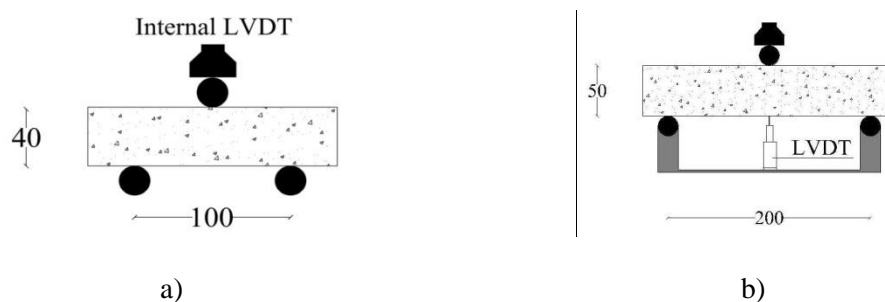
Test setup for three point bending test using un-notched specimens: a) M1 and b) M2 (dimensions in mm)
